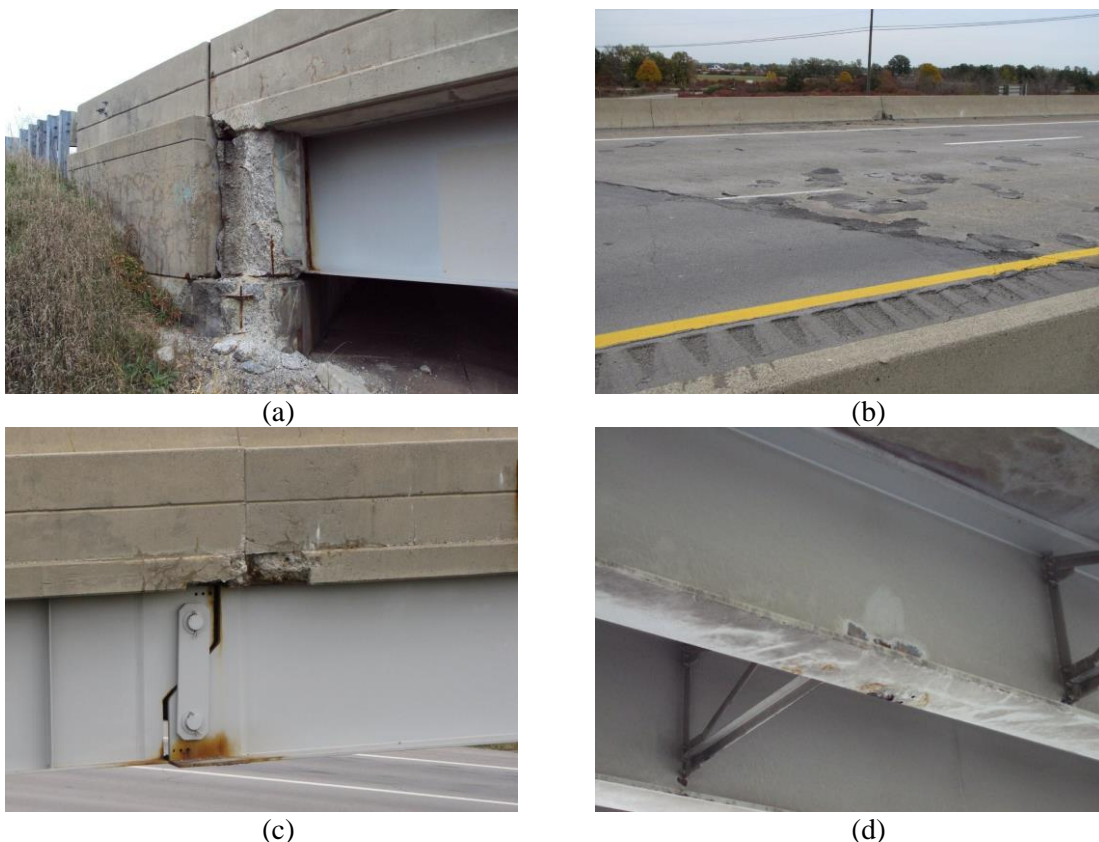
Deterioration history of the TRB: (a) northern abutment failure; (b) severe top-deck cracking and spalling; (c) pin and hanger plate corrosion; (d) web fatigue cracking.
